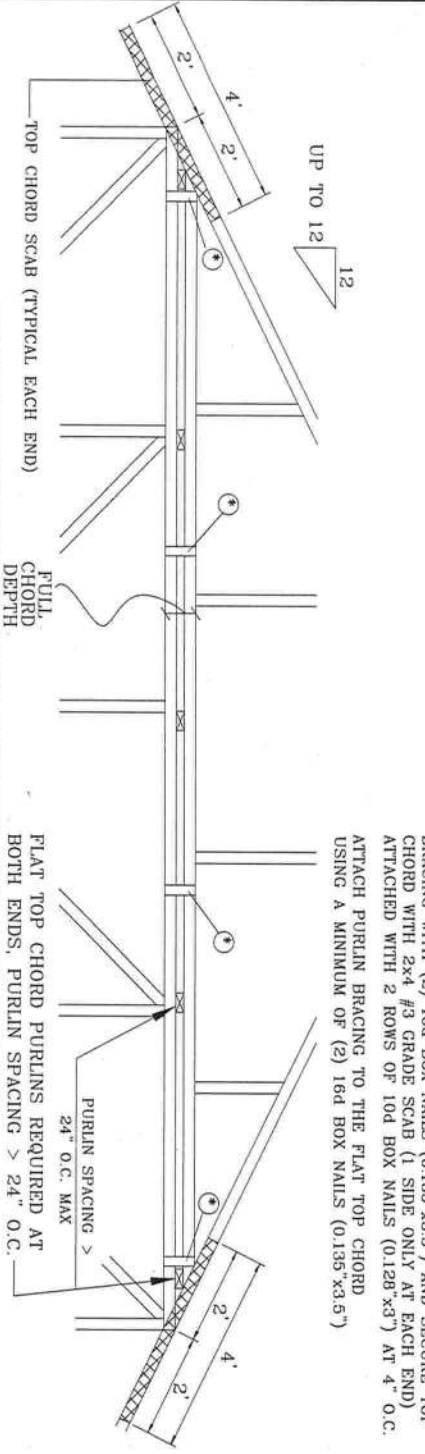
## DETAIL A : PURLIN SPACING = 24" O.C. OR LESS
